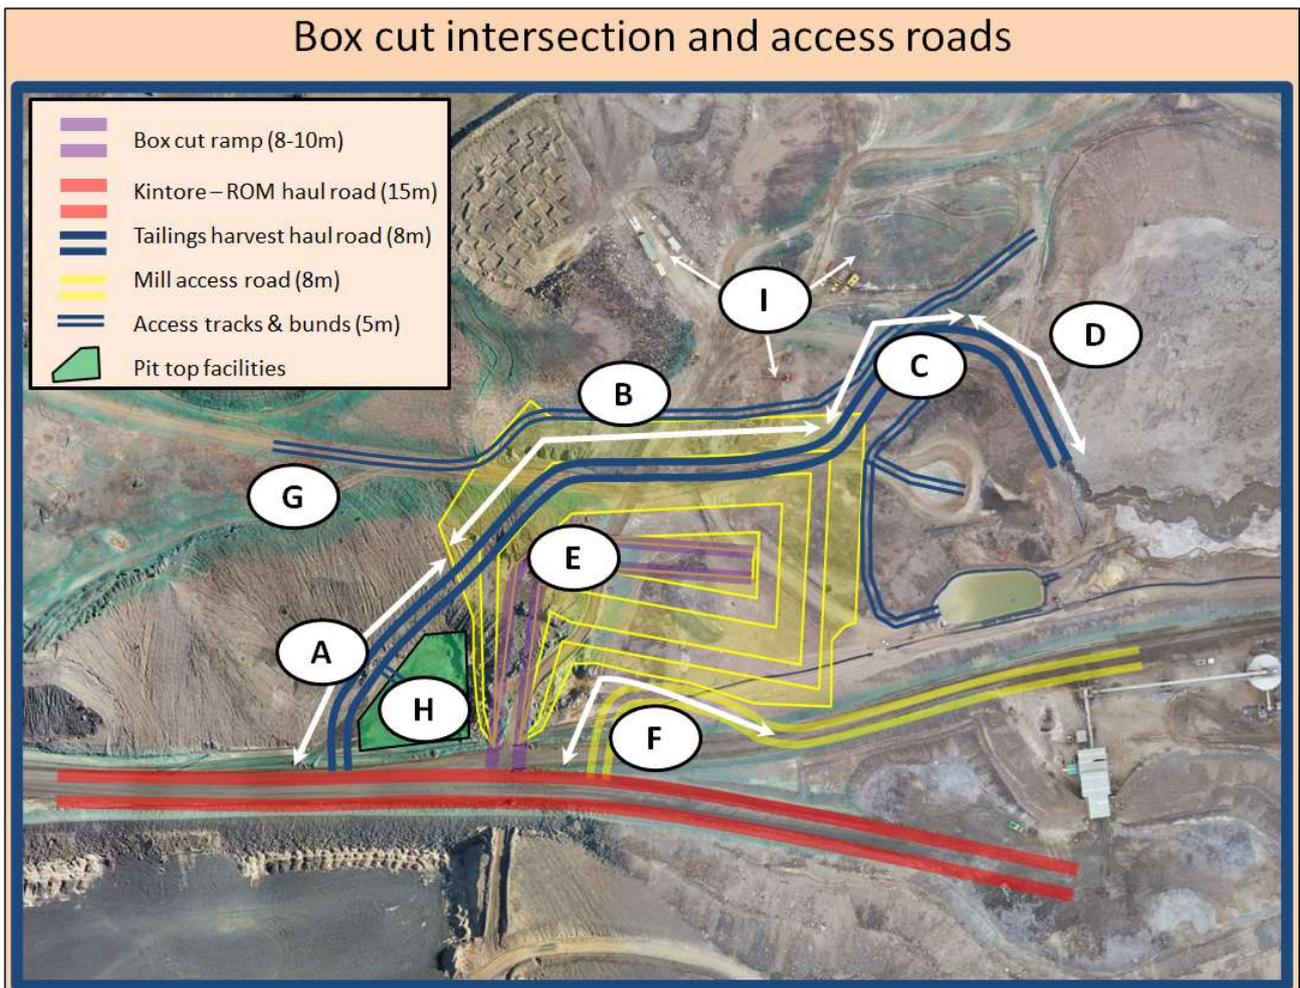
Proposed TSF2 tailings harvesting haul road construction
